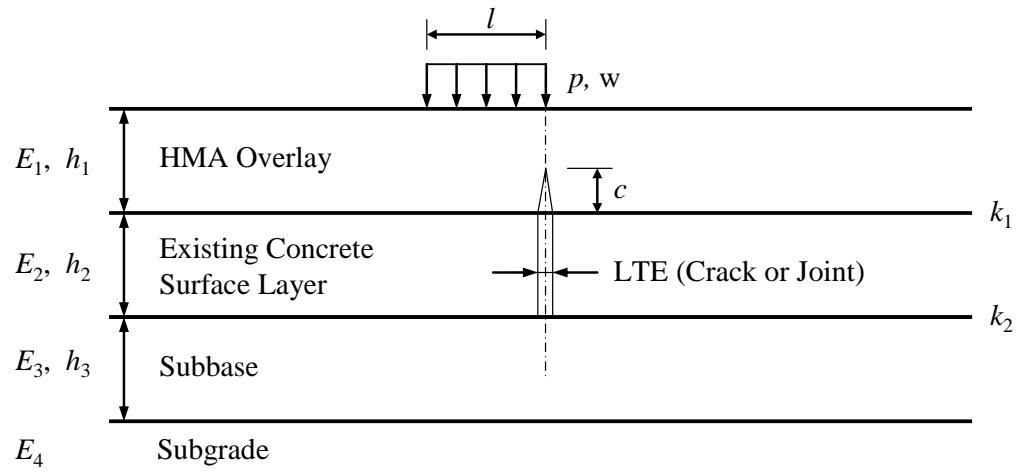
Diagram of HMA overlay on jointed concrete pavement-shearing.
